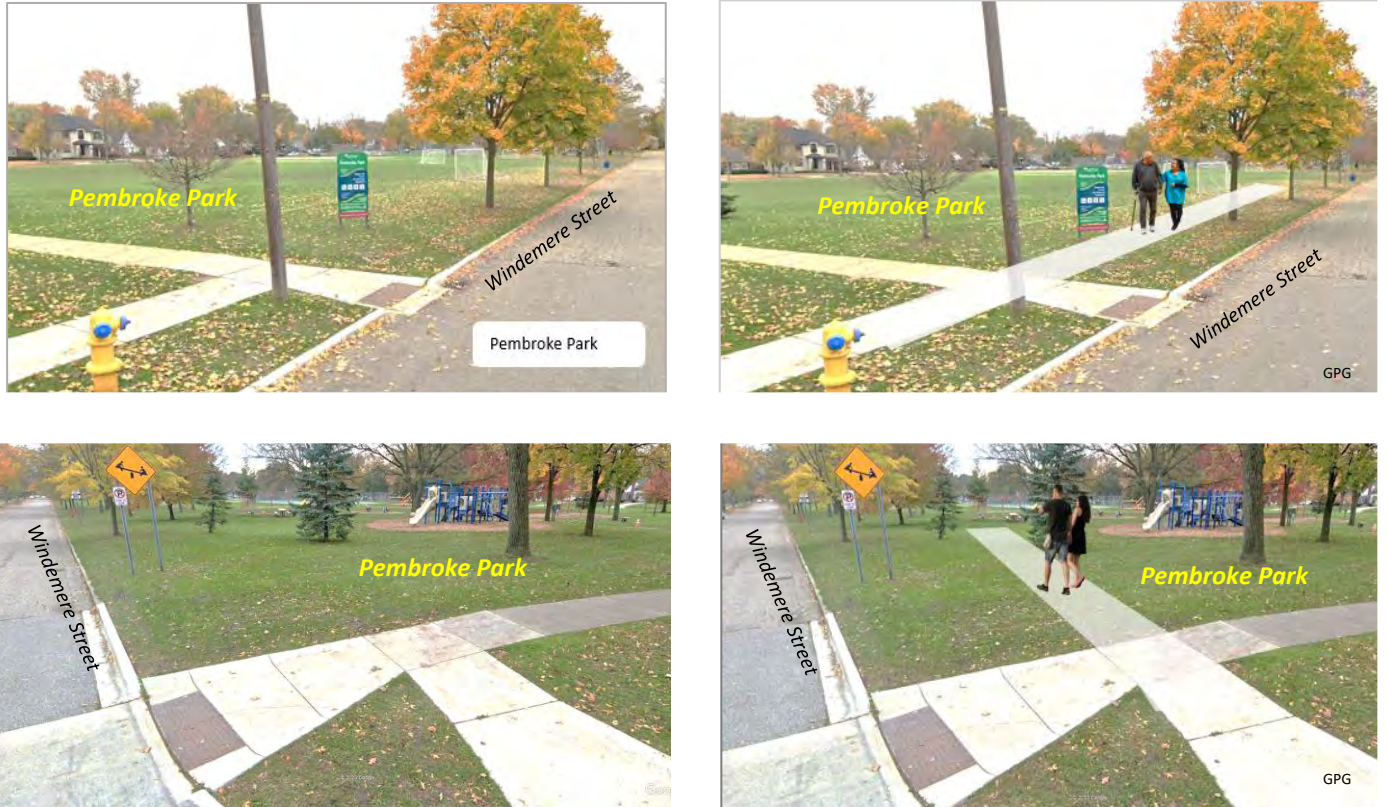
Above, GPG's recommended new sidewalk along Pembroke Park's north edge-Windemere Street.
